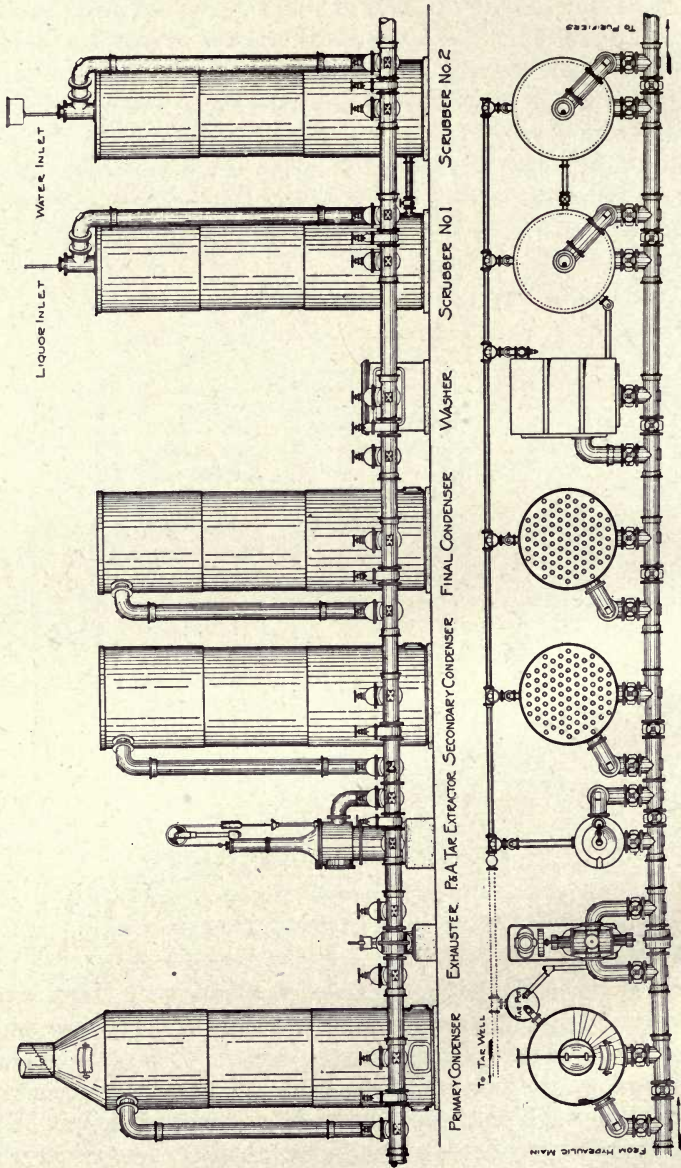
Scrubbing and condensing system with P. and A. Tar extractor.
